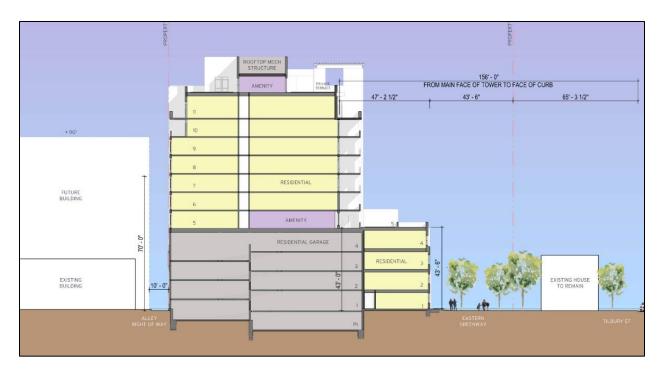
Section looking north towards West Virginia Avenue showing relationship of building to Eastern
